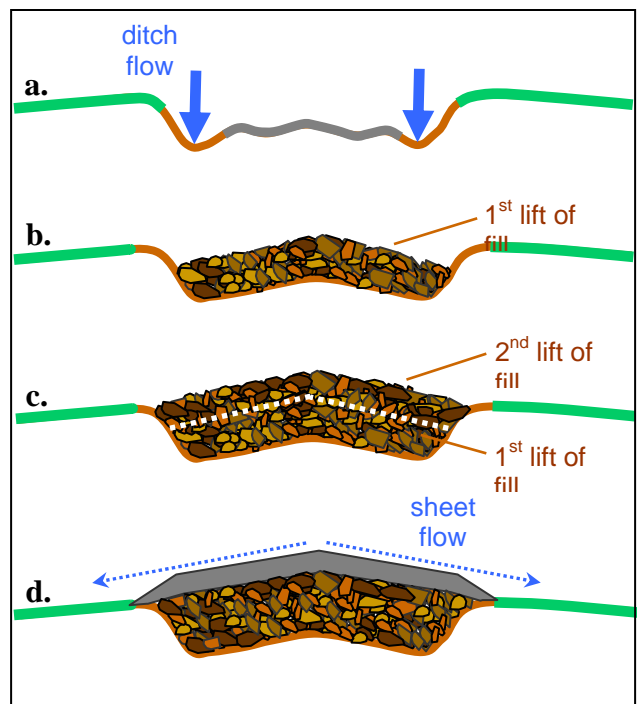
Sequence of filling the road profile: a. existing entrenched road; b. first layer of fill material; c. final layer of fill material; d. finished road elevation with new driving surface.
